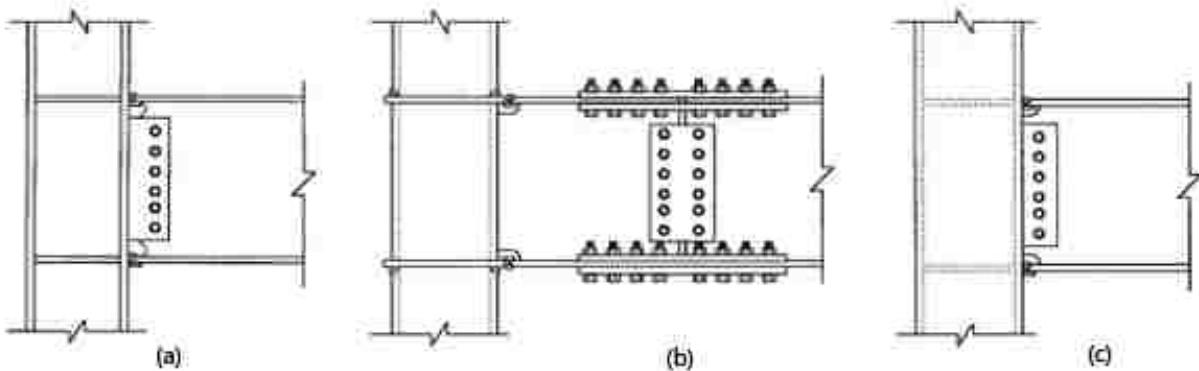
Welded Connection Details for (a) U.S. Pre-Northridge SMRF, (b) Japanese Cold-Formed Tubular Columns, and (c) Japanese Built-Up Box Columns (Nakashima et al 2000)
